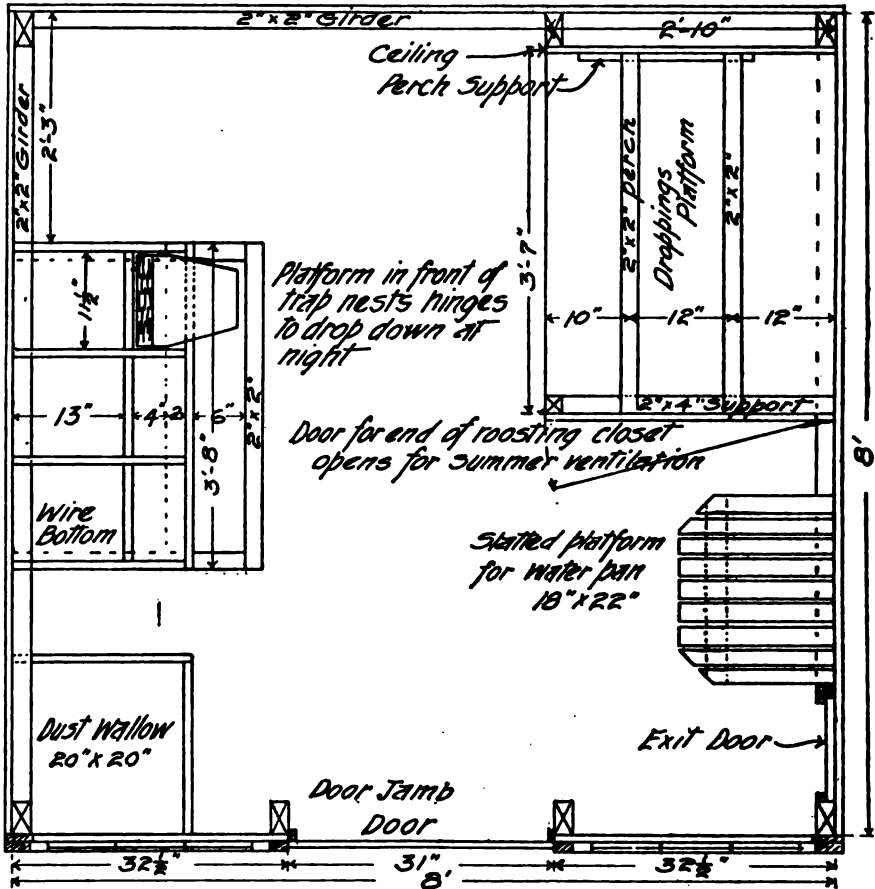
Floor plan of the Cornell breed-testing house, showing the location of different fixtures and timbers
